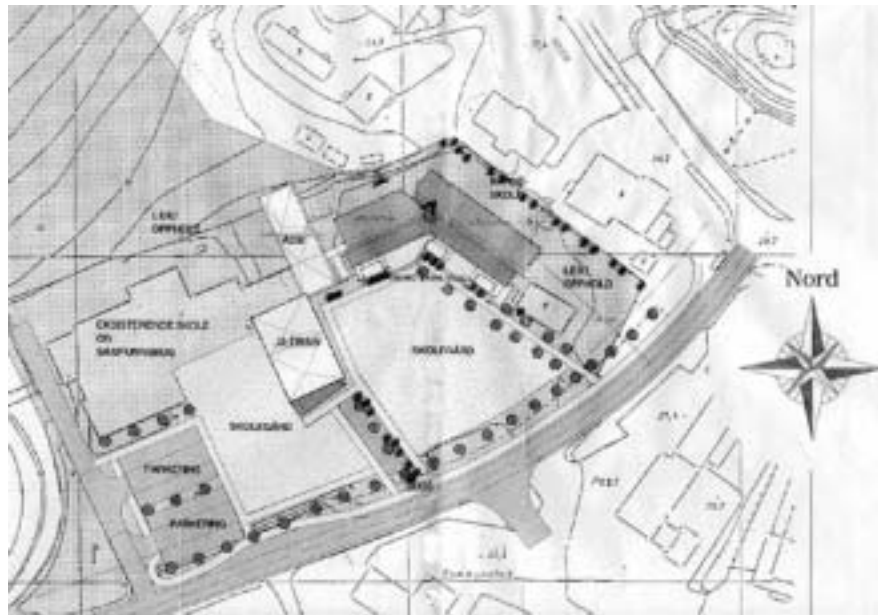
The site plan showing Mediå School and the primary school building (shaded) with surrounding buildings and infrastructure.
